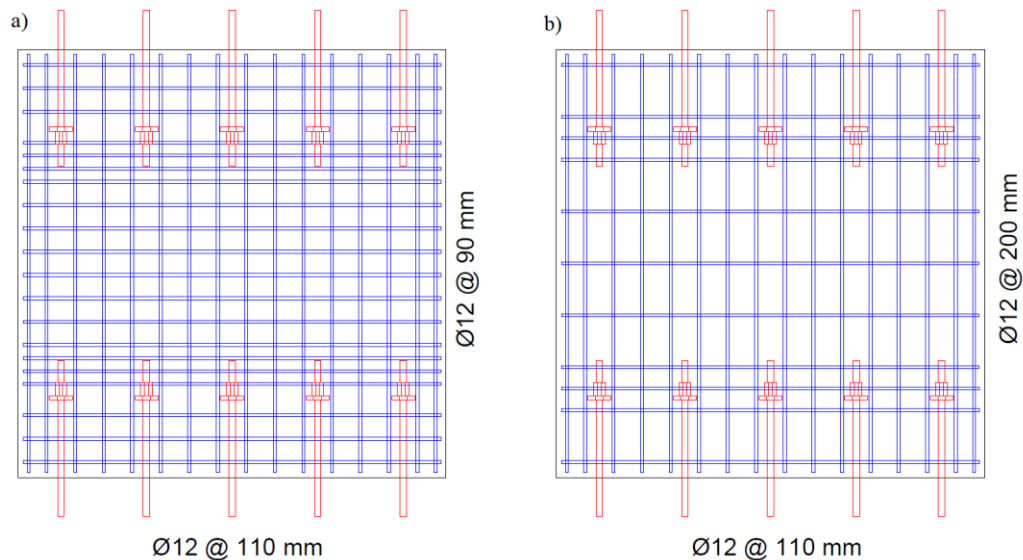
Reinforcement layout for type-A slabs: a) bottom face; b) top face.
